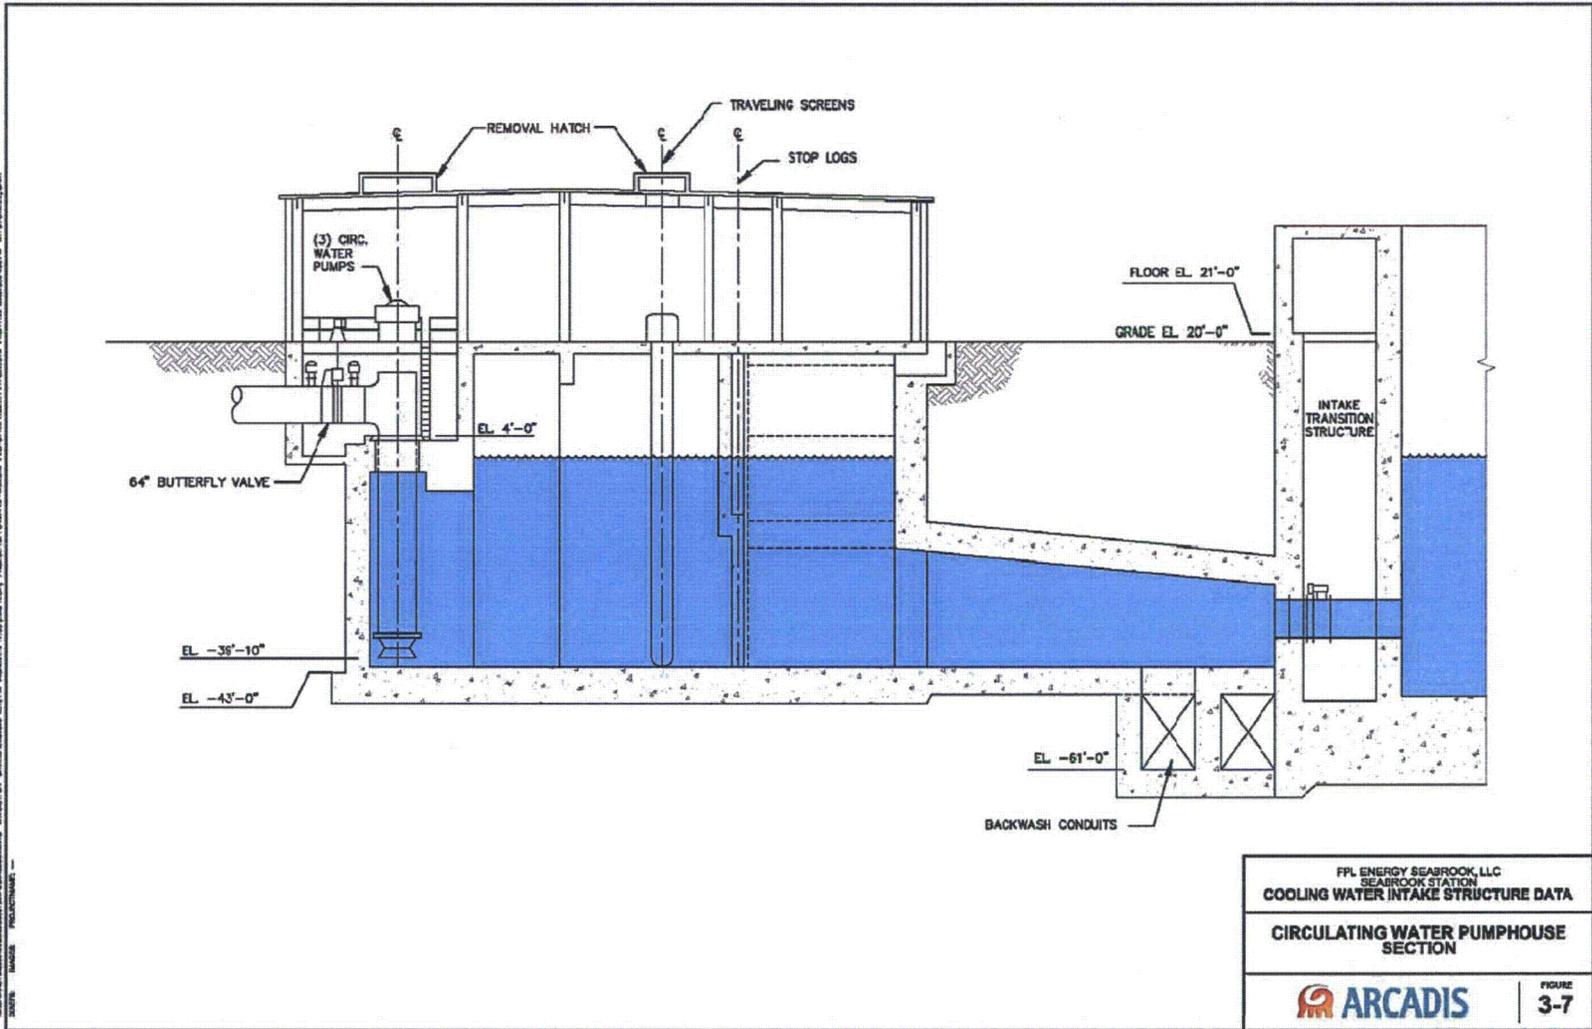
Seabrook Nuclear Power Station circulating water pumphouse section.
